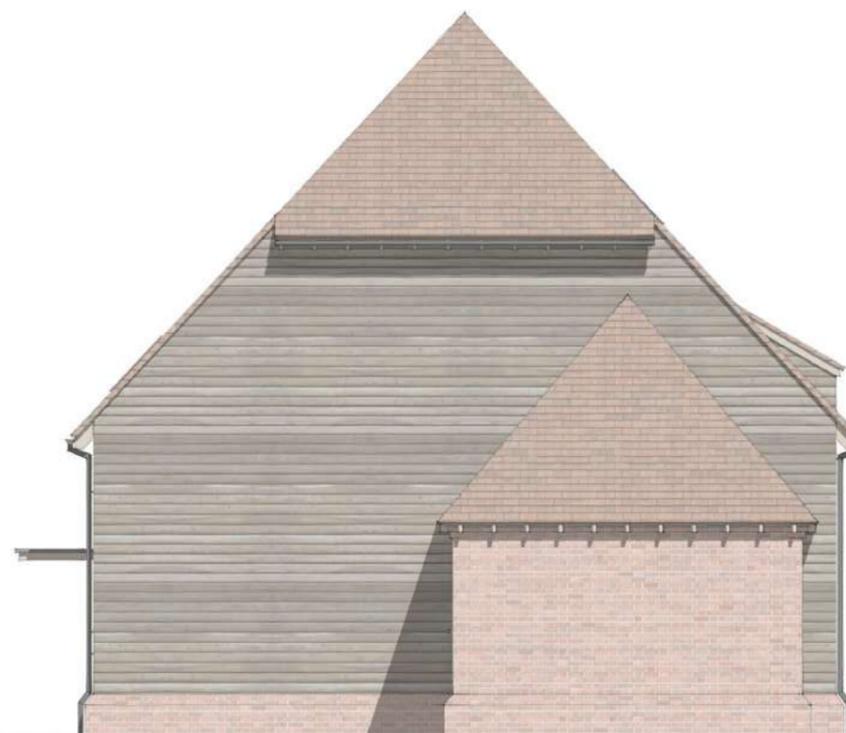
Sample Proposed Elevations - Plot 2 (End of timber clad barn terrace)
